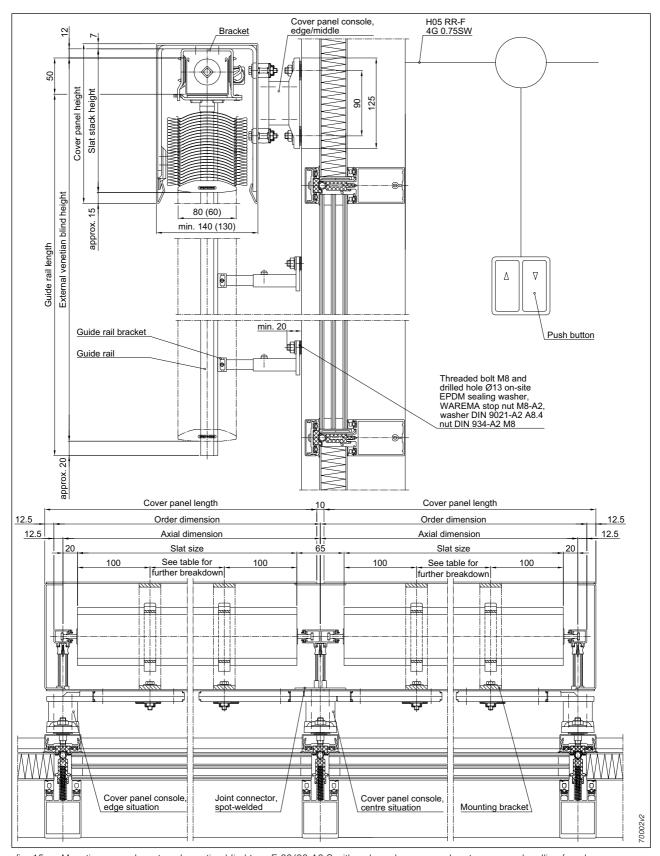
Mounting example, external venetian blind type E 60/80 A6 S with u-shaped cover panel on transom and mullion facade
